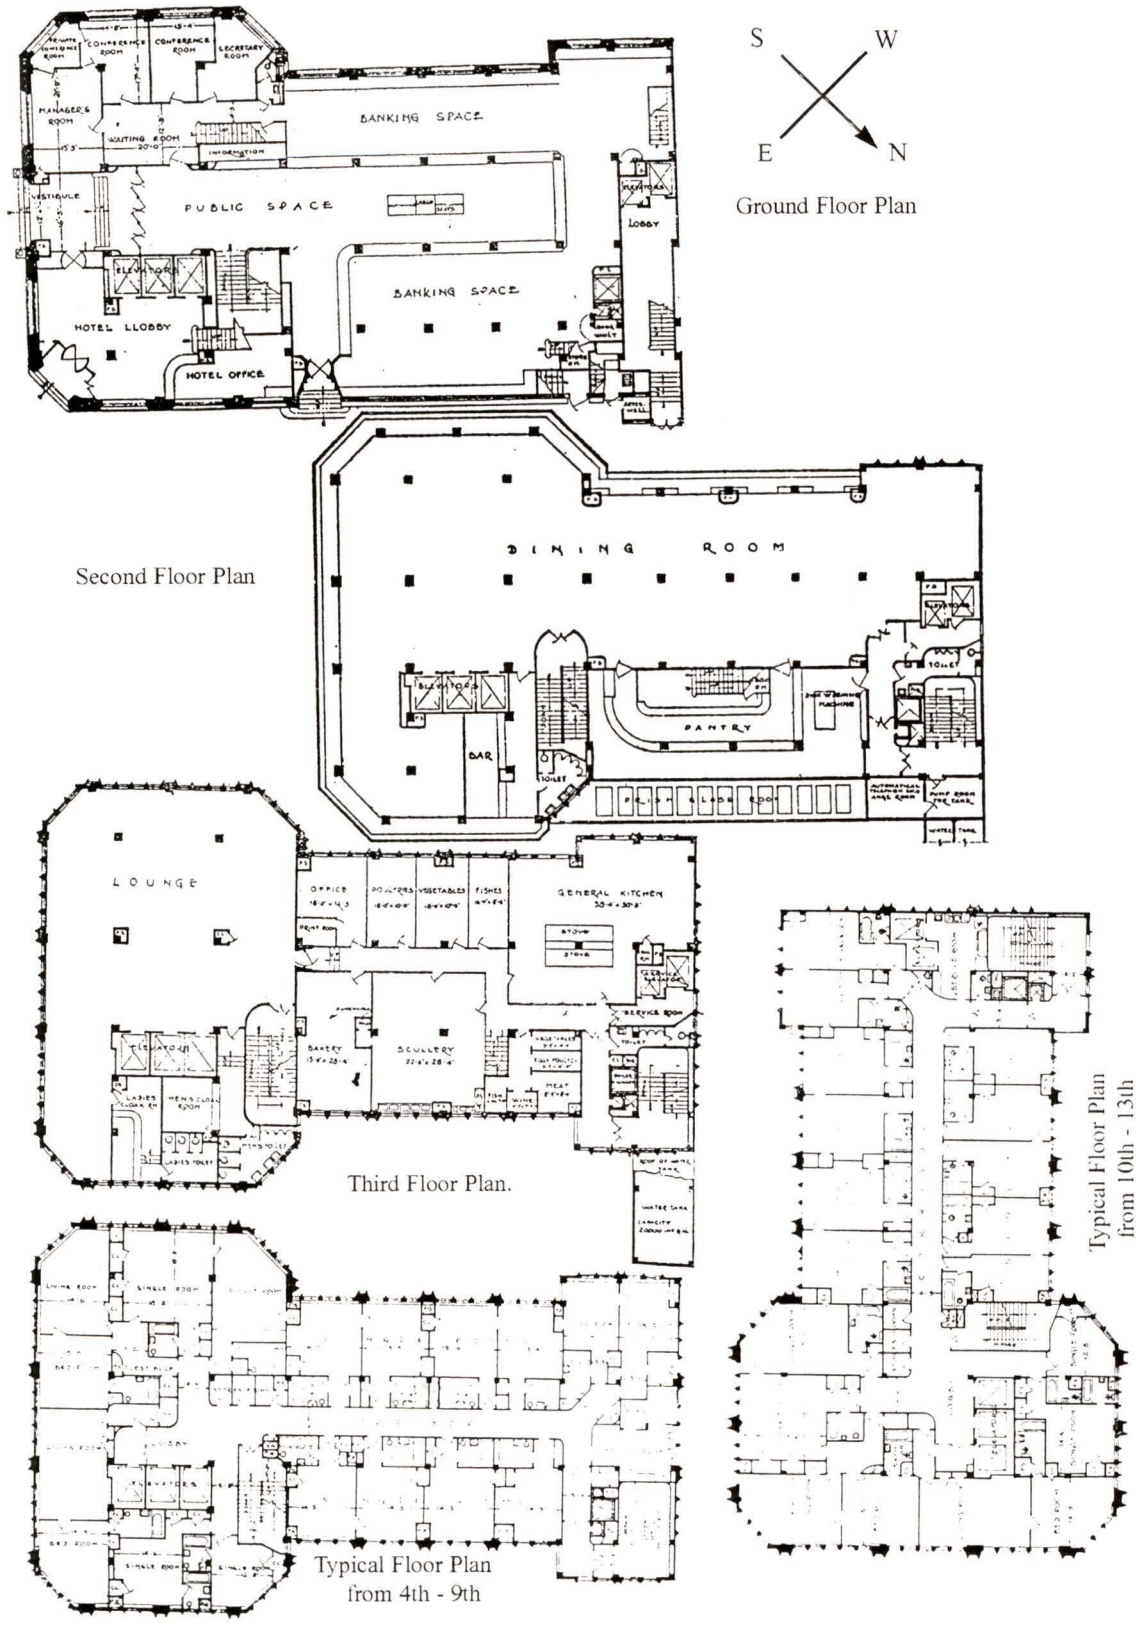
L.E. Hudec. Park Hotel floor plans: First to thirteenth floors.
